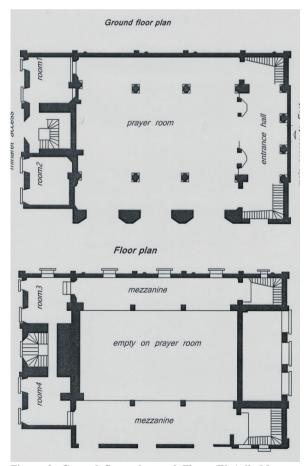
Ground floor plan and Floor (El Atik Mosque, Setif). Source : Authors
